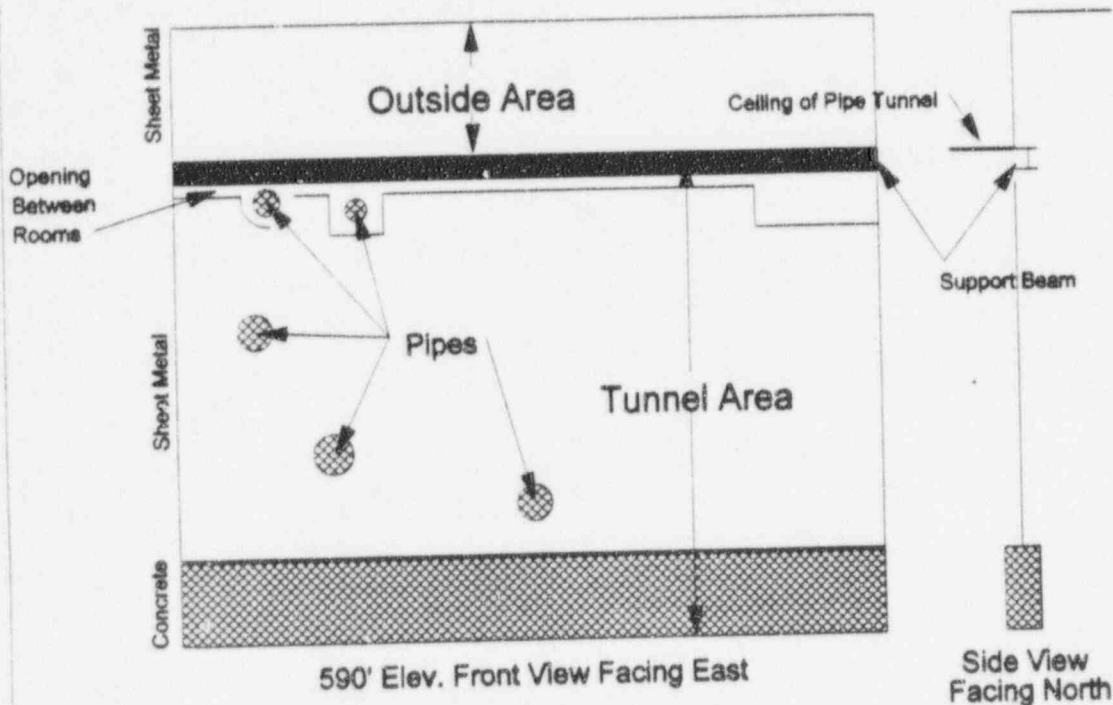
is an elevation view of the west wall of the Turbine Lube Oil Room. An opening approximately nine inches wide running the width of the wall is located about 15 ft. high on the 21 ft. high wall, where the ceiling supports for the Feedwater Purity Tunnel were added. This provides a direct air flow path from the Turbine Lube Oil Room to just below the ceiling area of the Feedwater Purity Building. In addition, various piping penetrations are made in the west wall that are not sealed around the annular spaces. The upper 5 to 6 ft. of the Turbine Lube Oil west wall is above the Feedwater Purity Tunnel ceiling and is exposed to the outside plant area.
